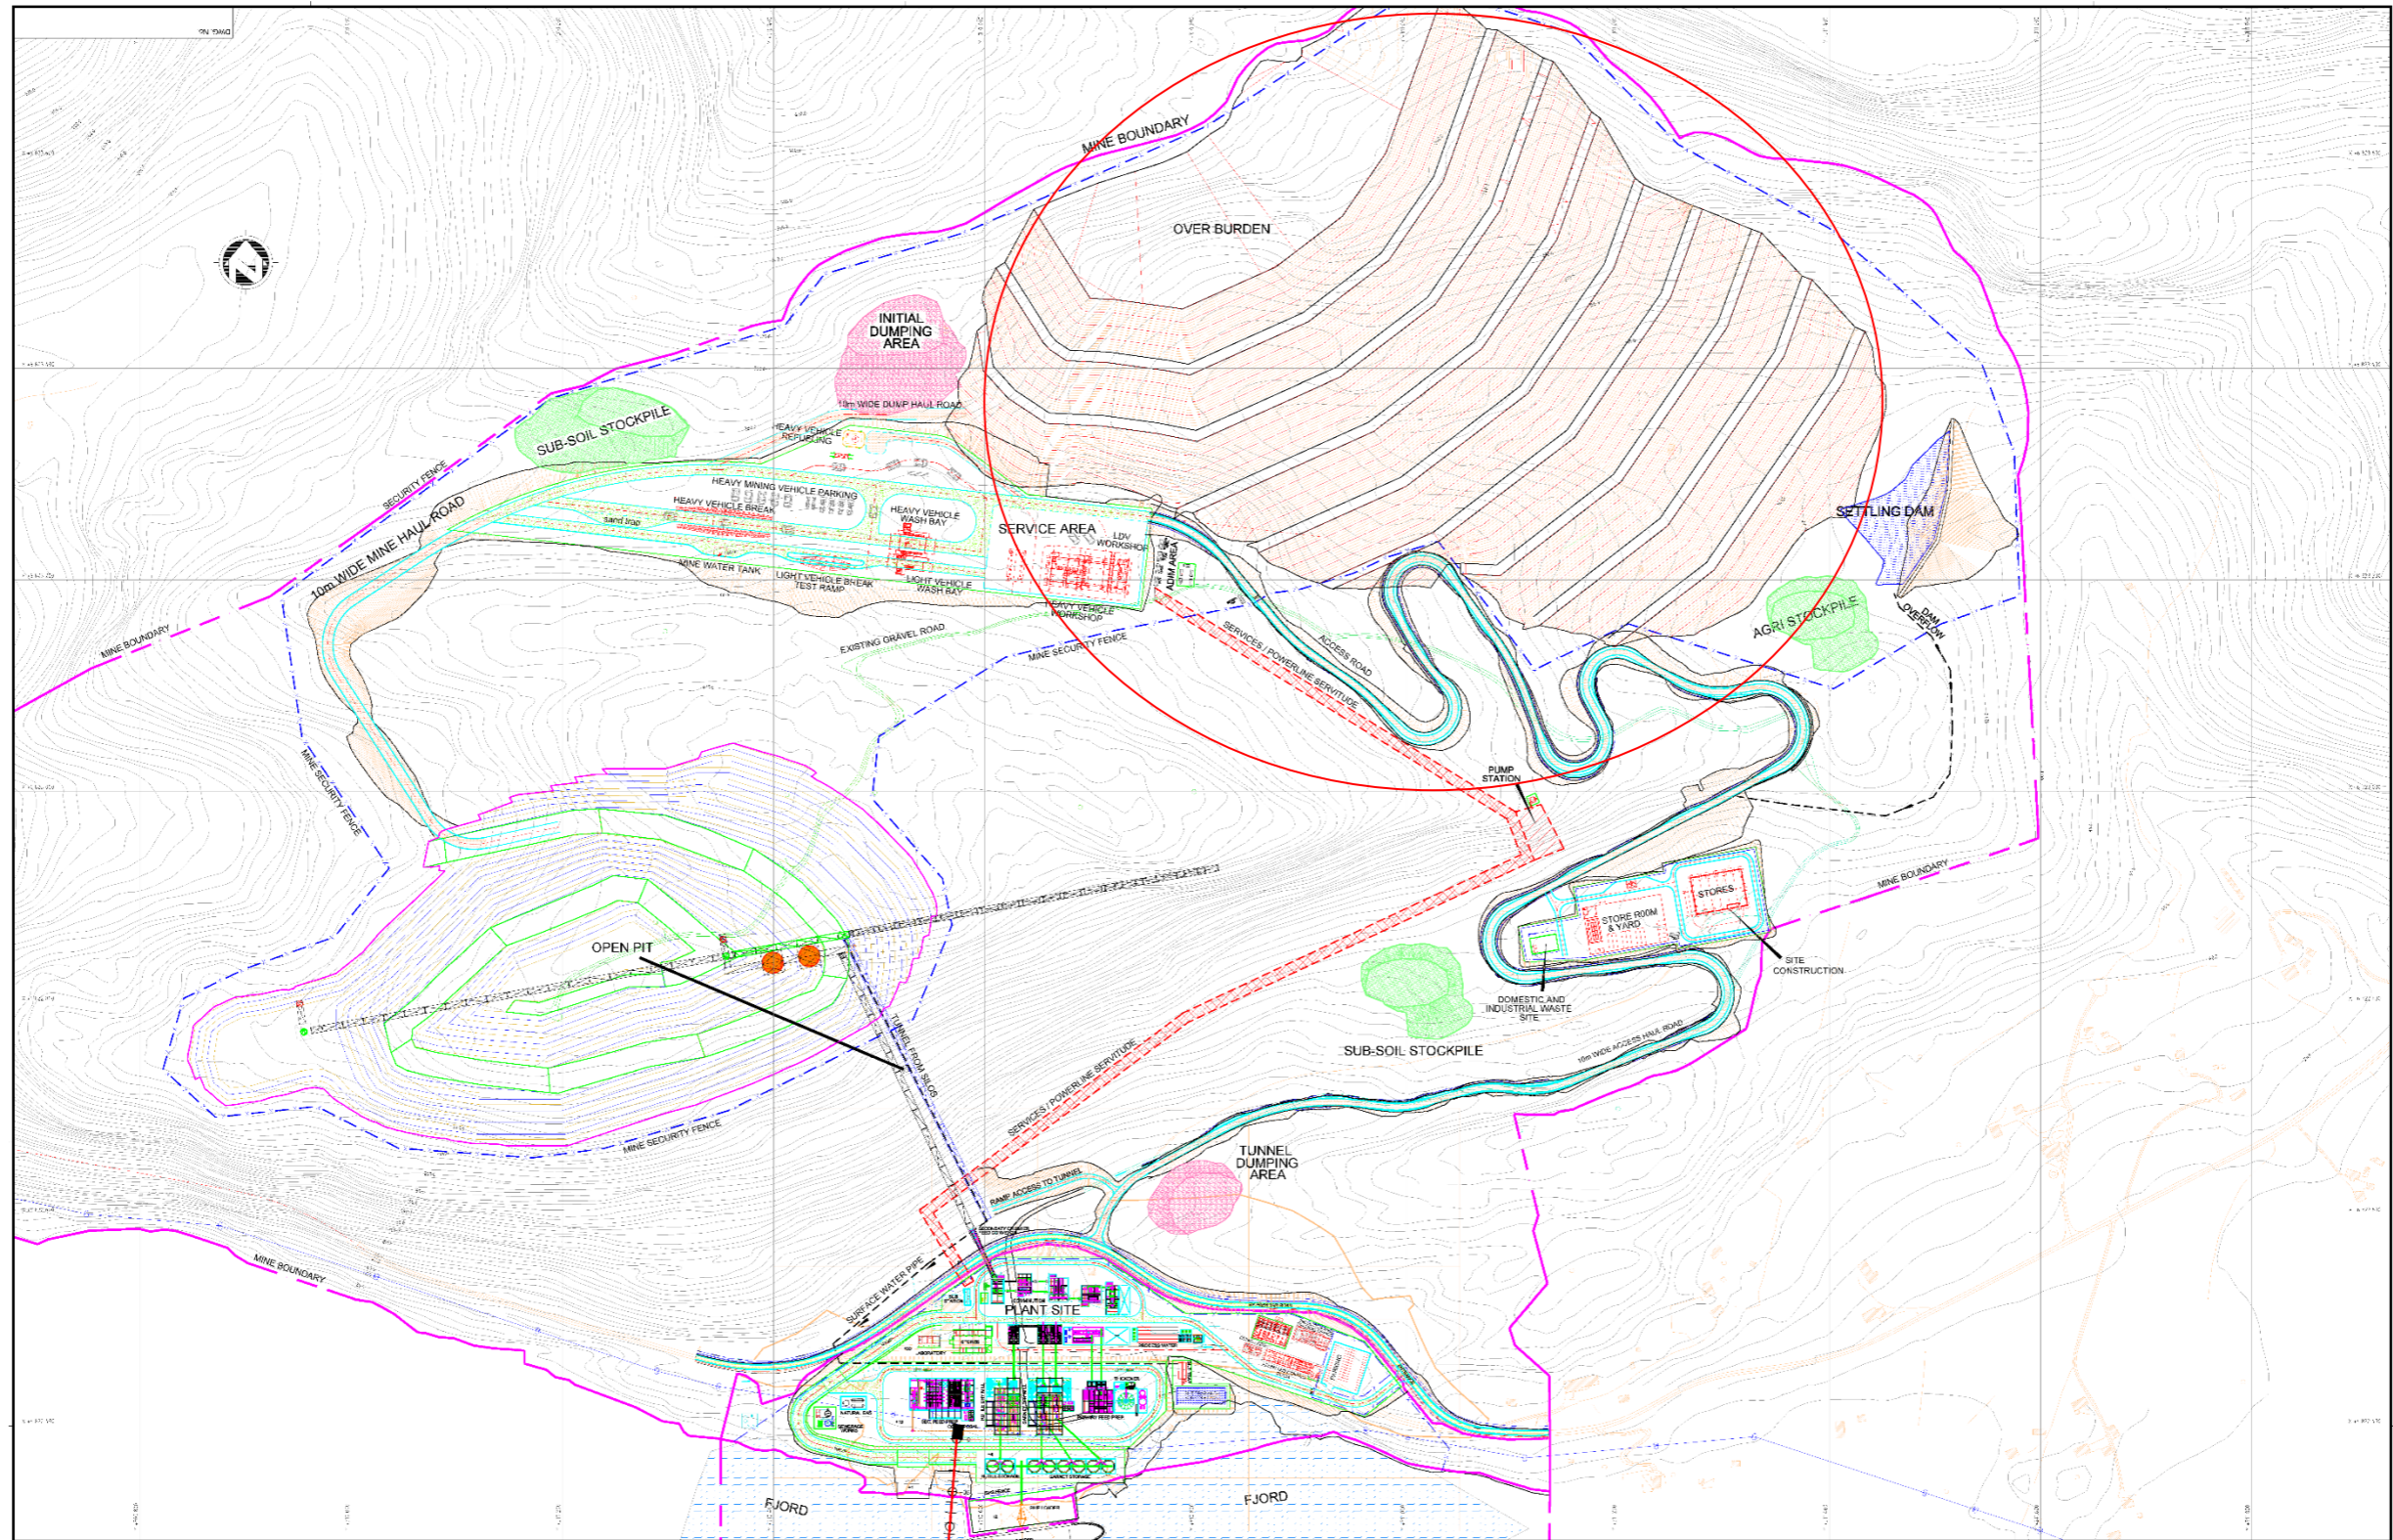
Plan Showing Waste Rock Disposal Facility (circled)
